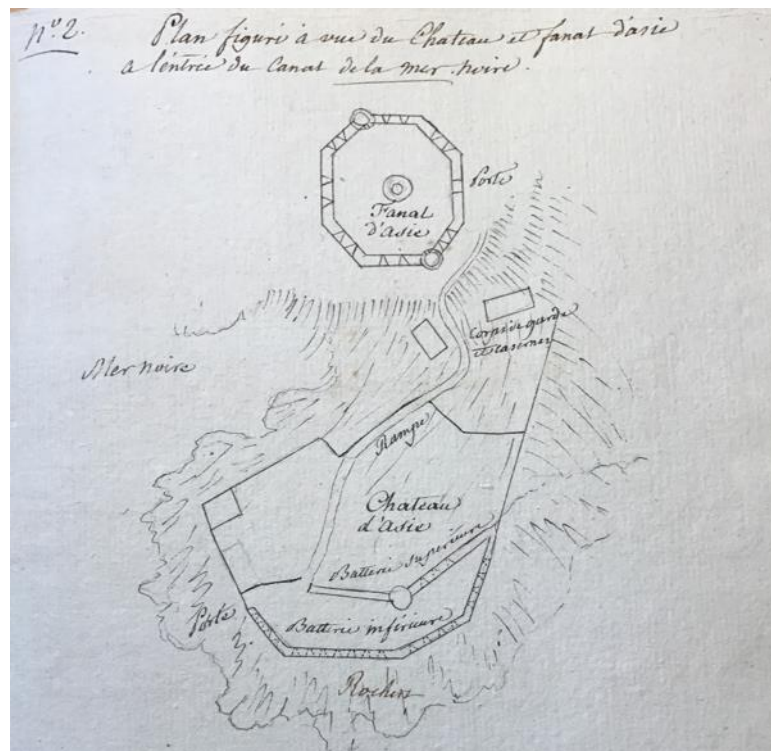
Lafitte's Plan of Anadolu Feneri Fortress. "Plan Figure a vue du Château et fanal d'Asie a l'entree du Canal de la Mer Noire" (SHD, 1 VM 275, 14a, N. 2)
